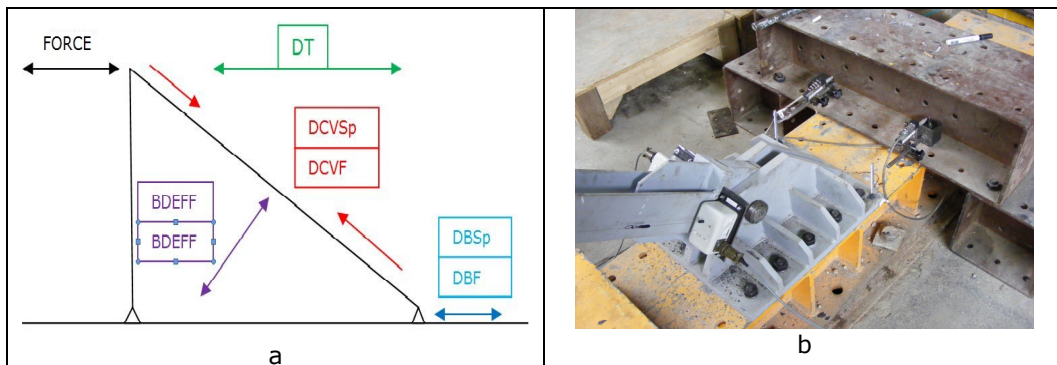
a) Measurement devices positioning scheme; b) Positioning of measuring devices on the HEA brace test specimen without damper
